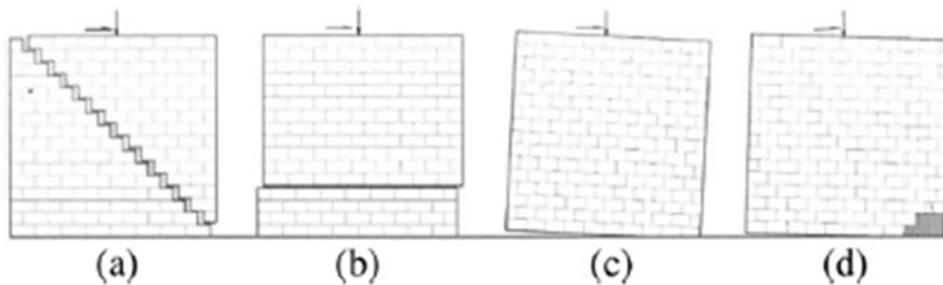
Failure modes of in-plane loaded masonry walls: (a) shear failure; (b) sliding failure; (c) rocking failure; and (d) toe crushing failure (Kalali & Kabir, 2012)
